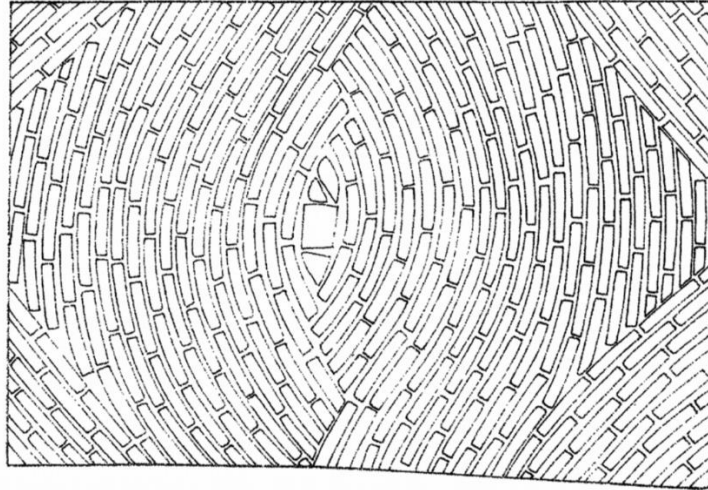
Plan View of pitched-brick vault technique, from Oates 1990
